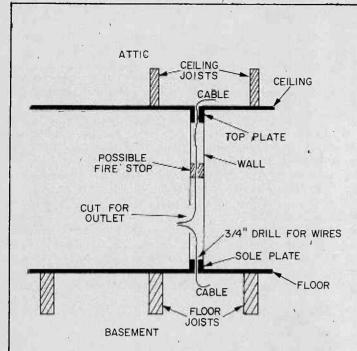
In typical modern wall construction used in your home there is a top and bottom (sole) plate to which the studs are nailed. You must drill through both the ceiling or floor and the plate in order to get your wiring into the wall. In some construction a fire stop (or "cat") is nailed between the studs. Either you must break through the wall in order to drill through the fire stop or route the cable up from the basement.
